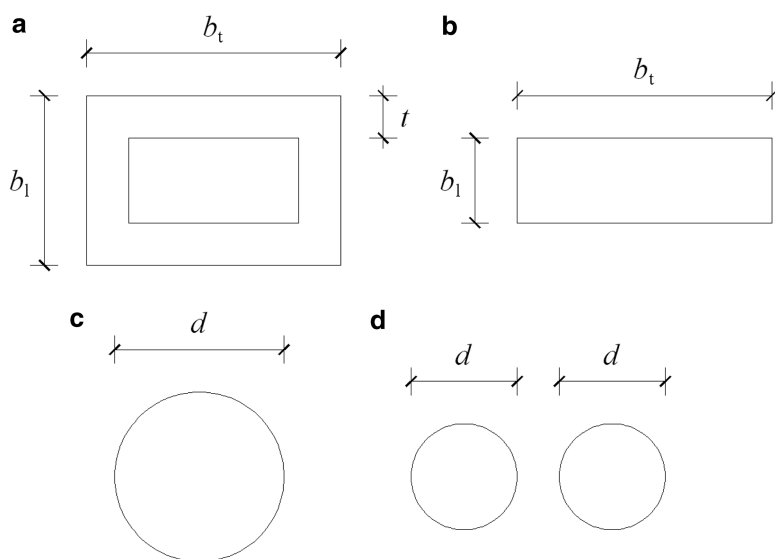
Pier cross-sections: rectangular hollow (a), wall-type (b), circular (c) and two-column circular (d)
